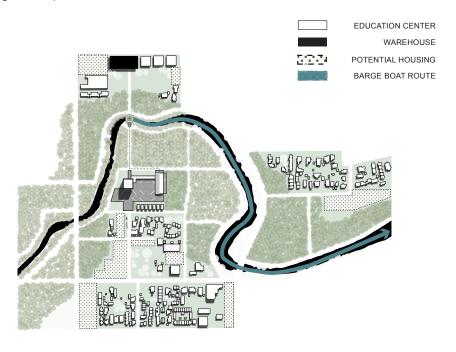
Site plan illustrating rebuild strategies and creating an education center
